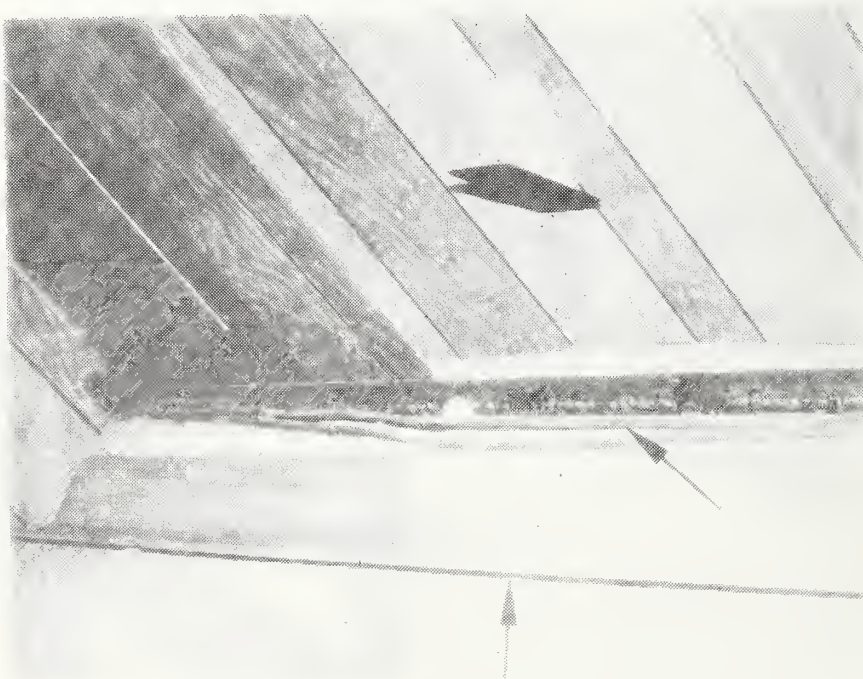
Lightweight Plastic Pipe Cover Removed in Sleeping Quarters to Expose Plumbing Pipe Running Along Wall (See Figure C-69).
